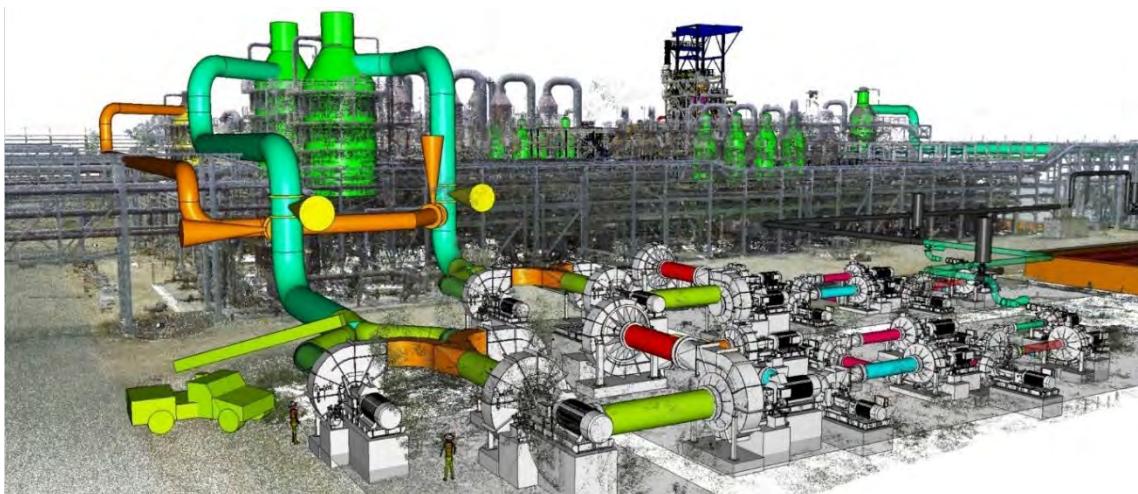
Evaporator compressor layout with 13 low speed compressors per train
